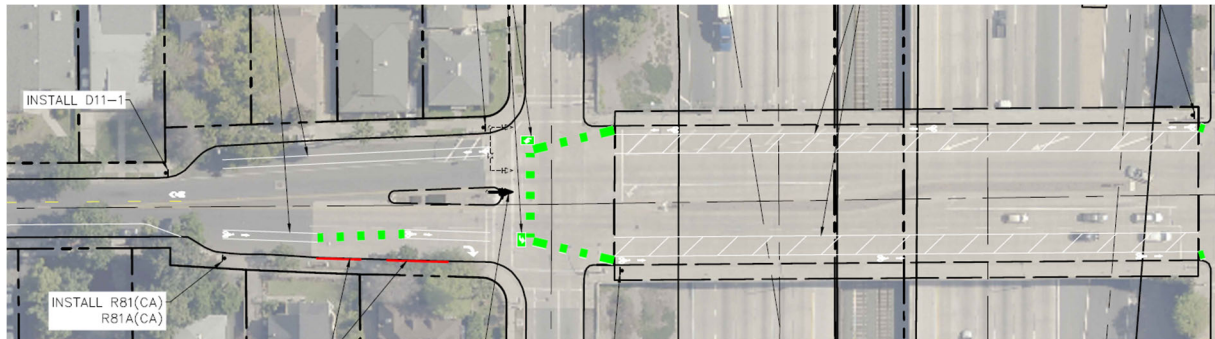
ON-STREET PARKING SHIFT WITH SHOULDER STRIPING, EL MOLINO AVENUE
